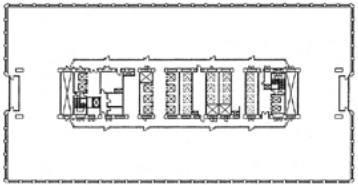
Typical floor of an office building with a center core system (Kasumigaseki Building, designed by Yamashita Sekkei)
